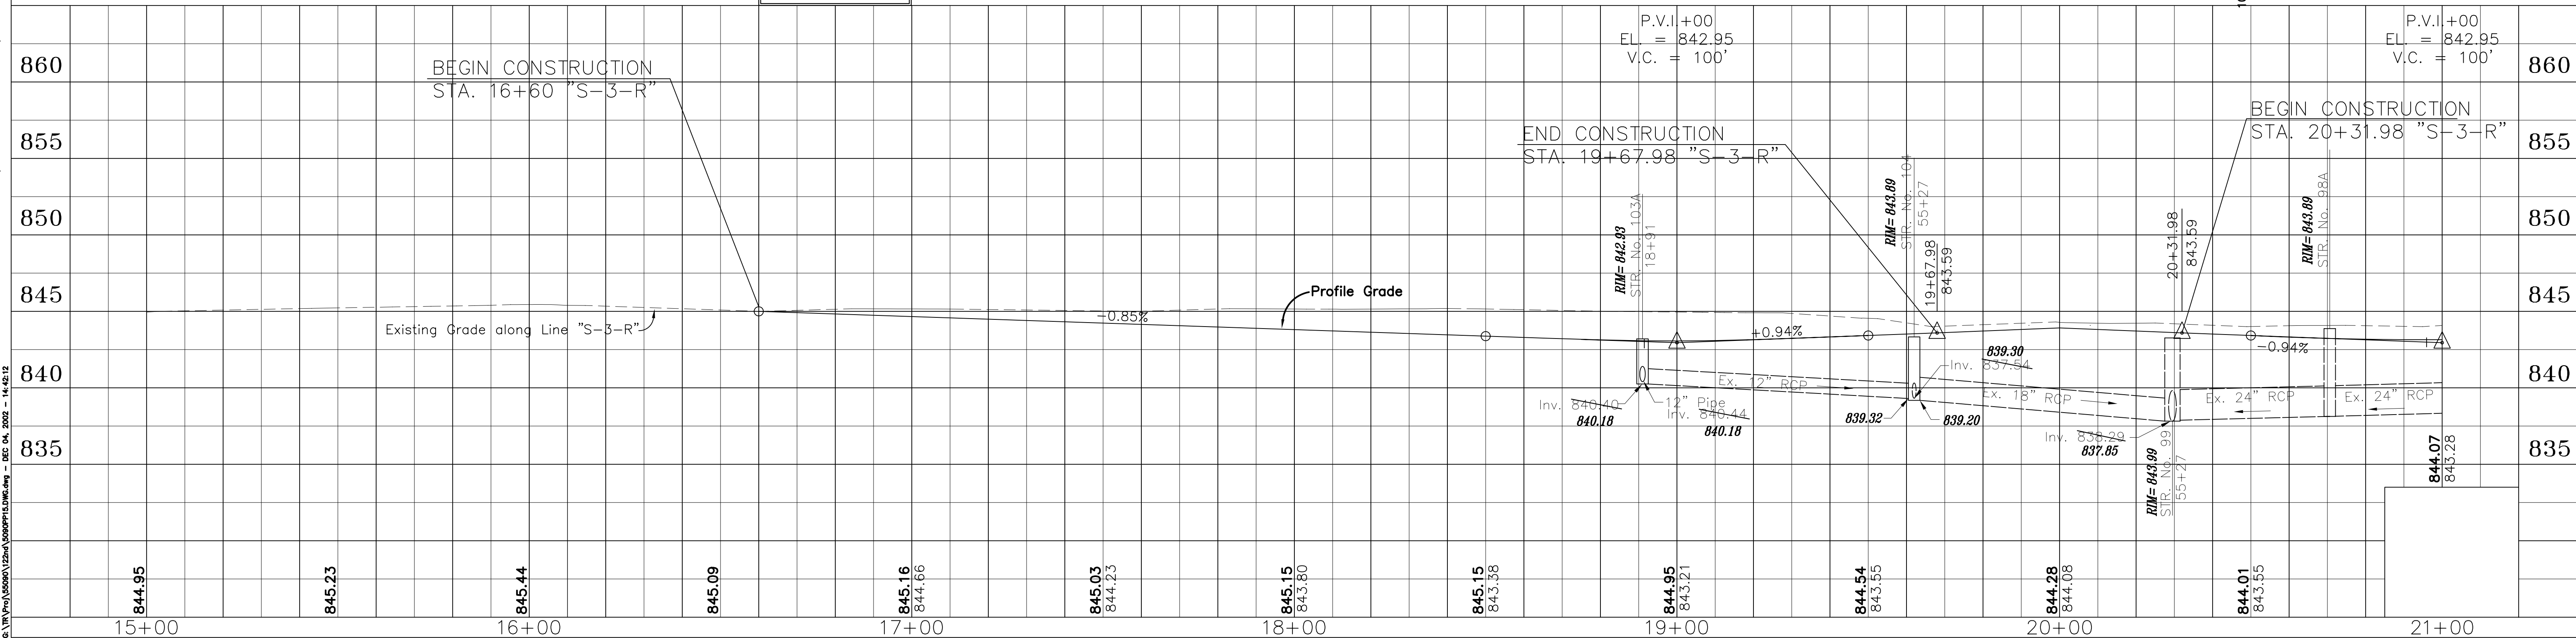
PLAN-PROFILE B. R. R. STANDARD
